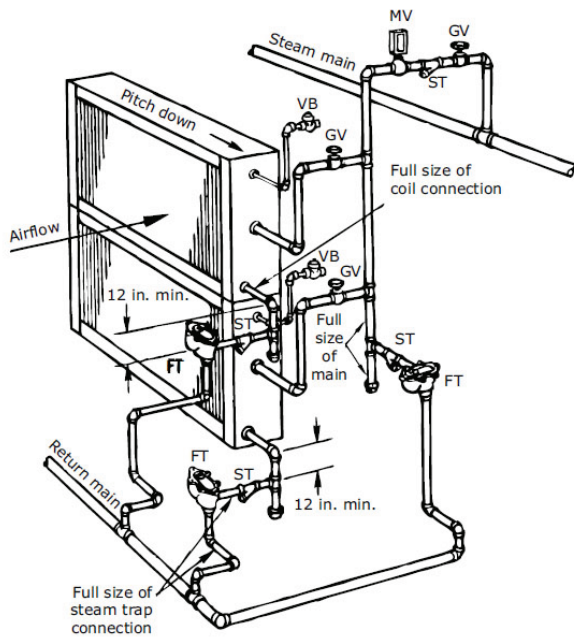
Typical piping for type NS steam coils, vertical tubes for horizontal airflow
